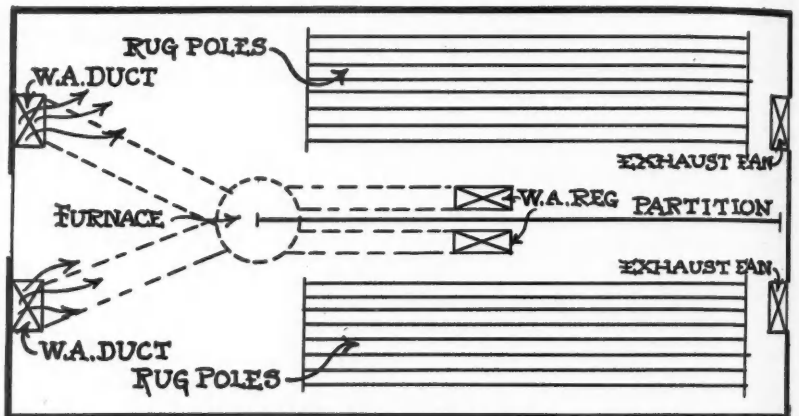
Plan of a Typical Carpet Drying Room, Moist Air Being Eliminated by a Warm Air Furnace and Exhaust Fans.
